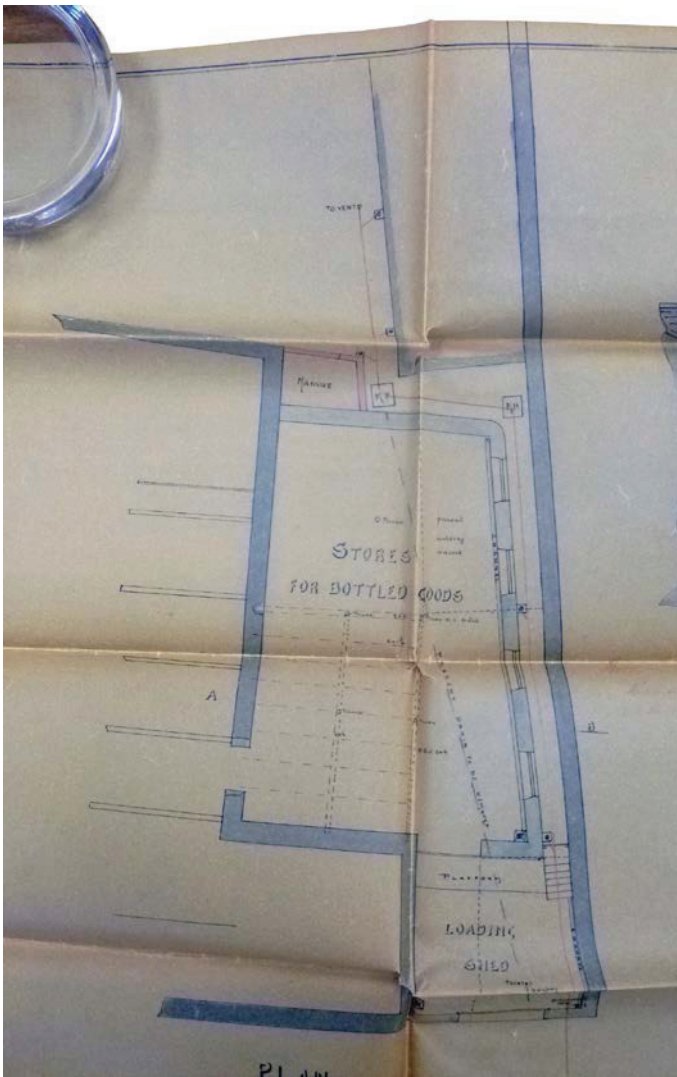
(left): Plan for proposed addition to the Old Brewery, 1912
